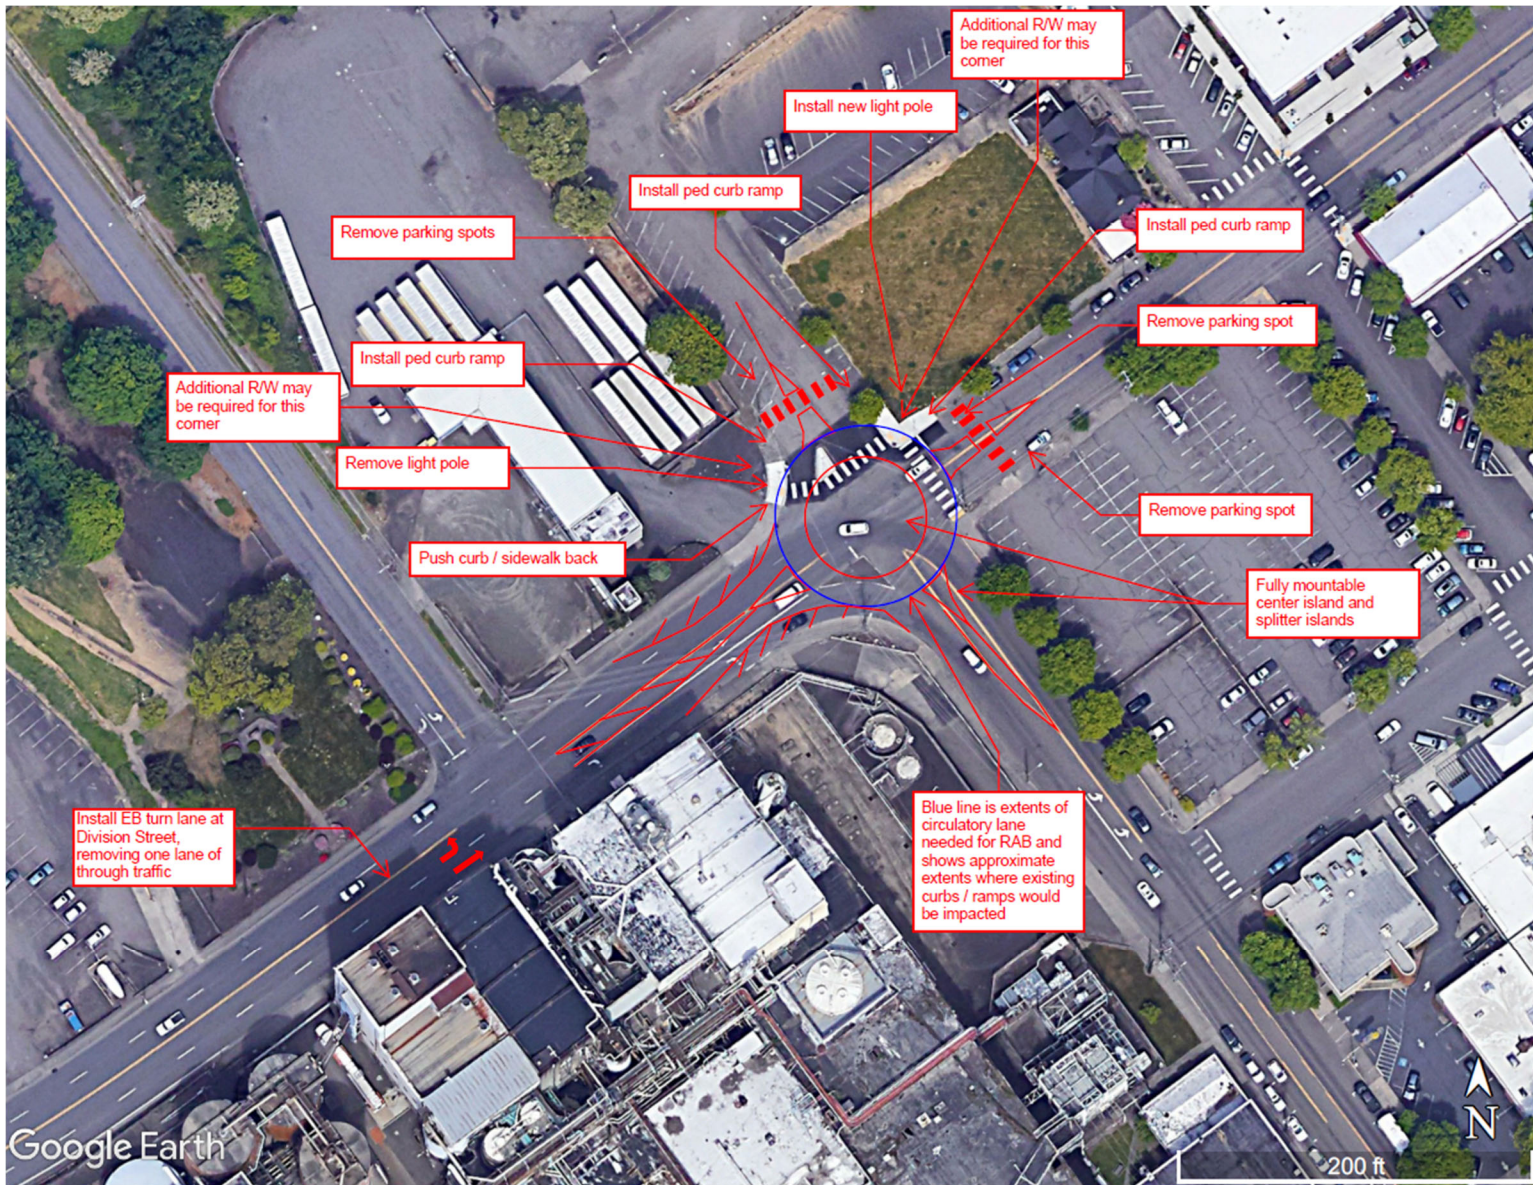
Conceptual Layout and Notes for a Mini Roundabout at NE 6th Avenue and NE Adams Street
